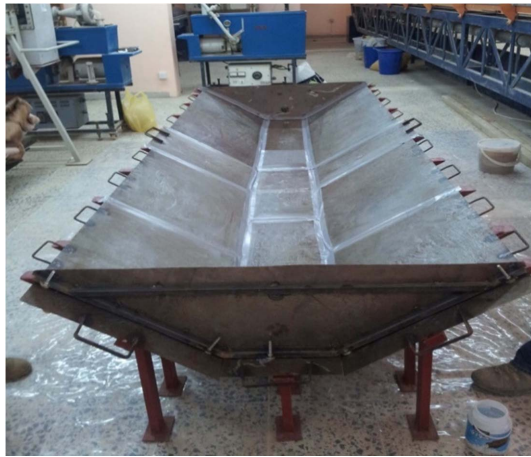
Steel Structure (Base Steel) Sheets as Mold for the Concrete Open Canal
